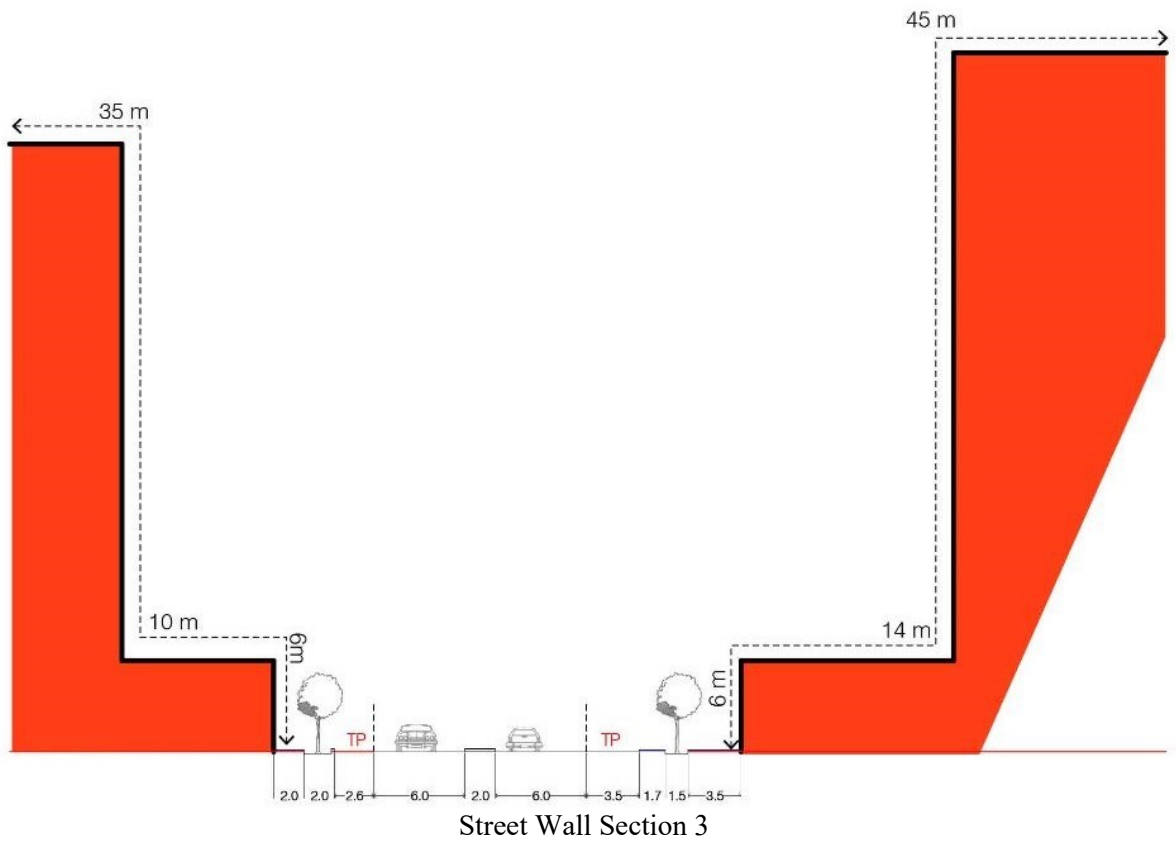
Street wall controls and street sections according to the proposed buildings guidelines in the intervention area. (Author, 2020)
